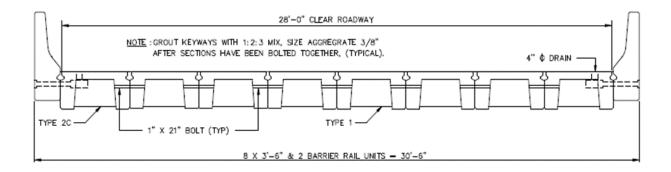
Typical channel beams placed adjacent to one another (Roddenberry, 2012)
